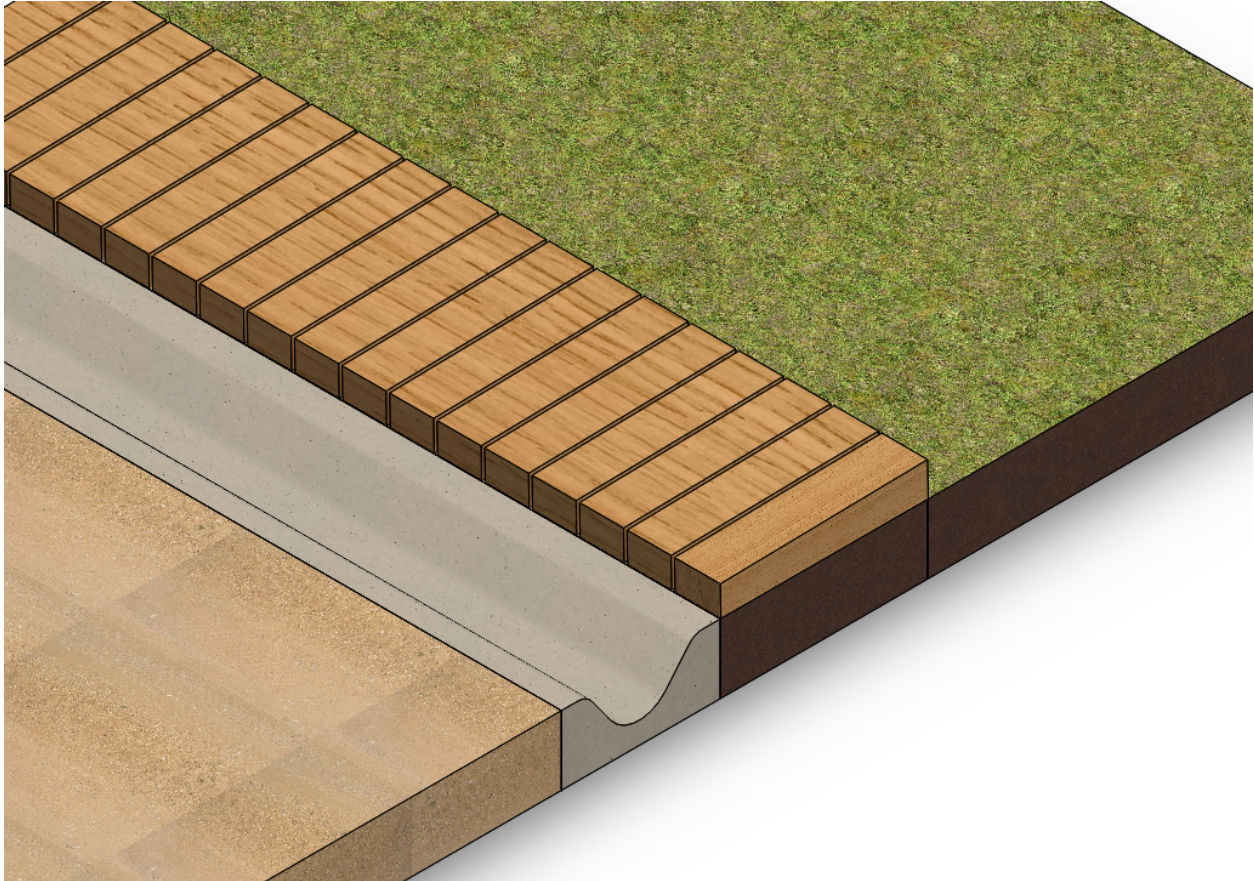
Design 2.a pictured as applied near a roadway with adjacent culvert.
